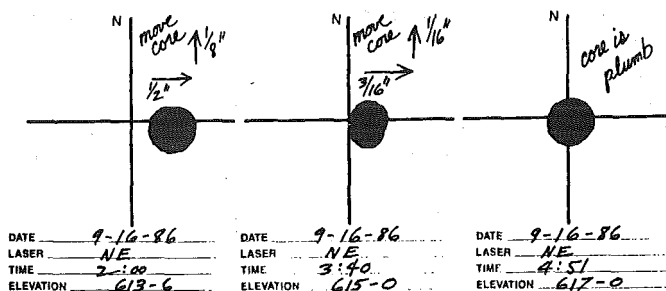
Monitoring Slipform Movements by Lasers (Courtesy of Concrete Construction)
